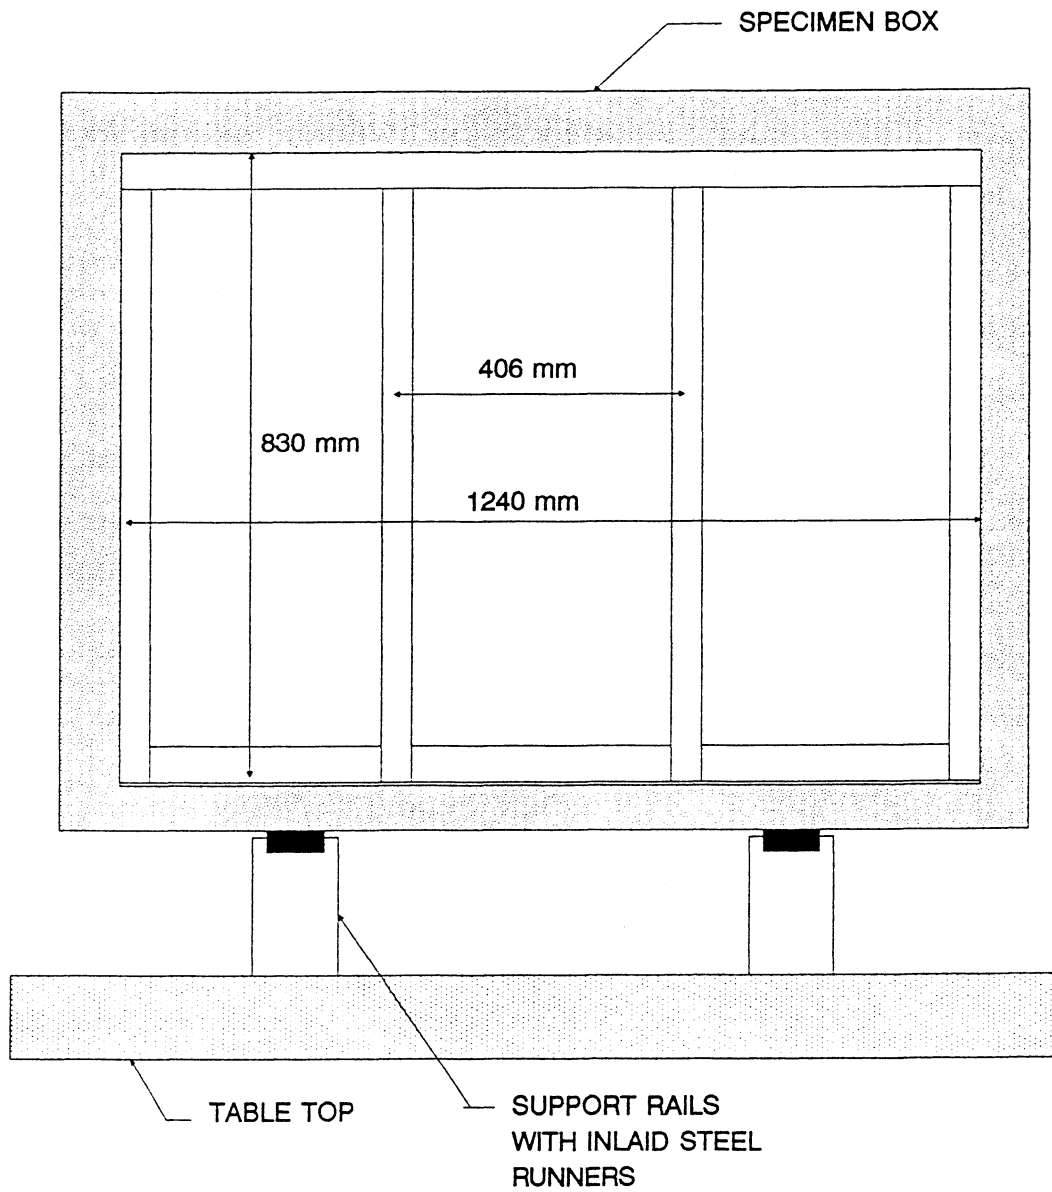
Specimen Box with Typical Steel Stud Arrangement - ESTA 1
